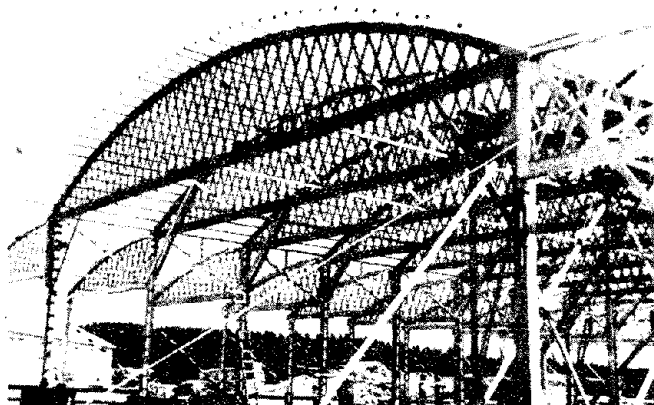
Building Under Construction, Using Segmental Latticed Roof Trusses of 60 Ft. (18.29 m) Main Span.
